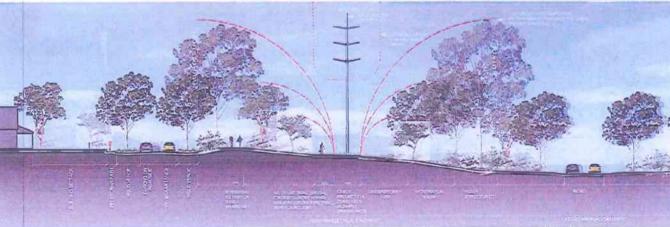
Typical Old Cooma Road Easement Section - Looking South
